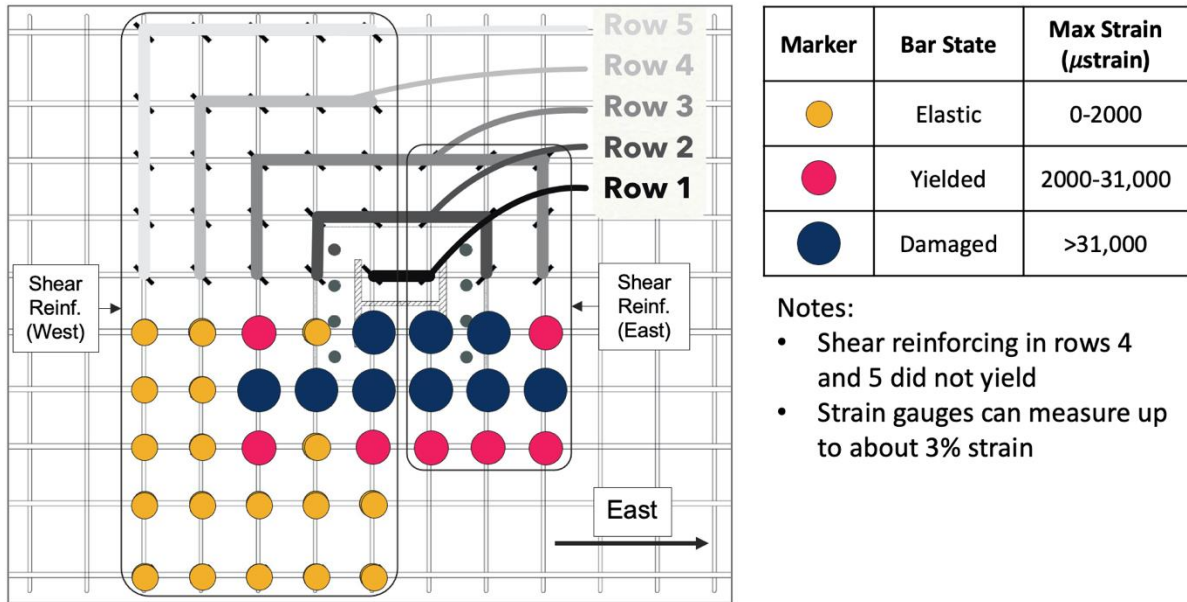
Specimen M02 plan view showing the final state of each instrumented bar and subdividing the shear reinforcing into rows.
